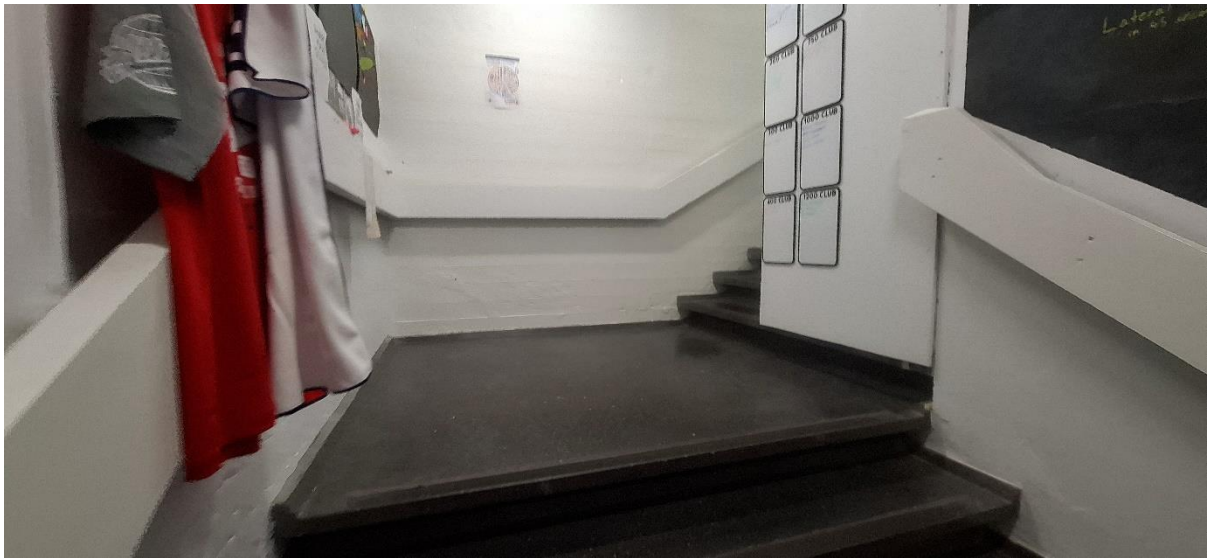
Internal west stairs showing reduction in width at the landing. Profiled with flared edge geometry terrazzo internal stair treads remain, but the original wall and handrails have been painted (2026)
